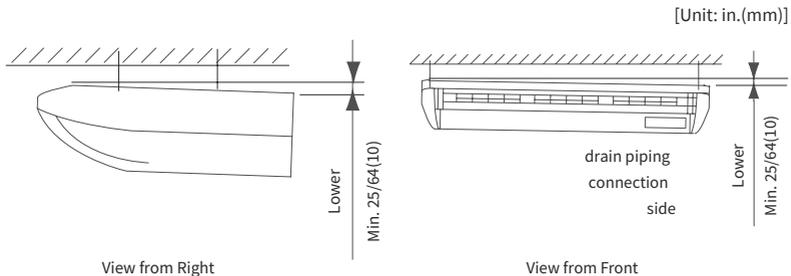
Inclination of Unit for Drain for ceiling installation
